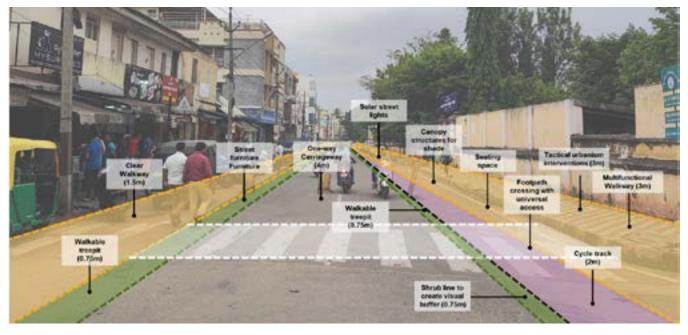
Indicative Krishna Vilas Road rendering (after)
